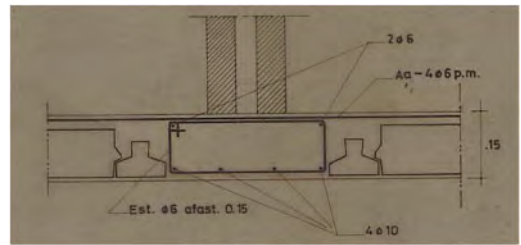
Lightweight concrete floor slab. “MAPREL” type detail © Arquivo Municipal do Porto.
